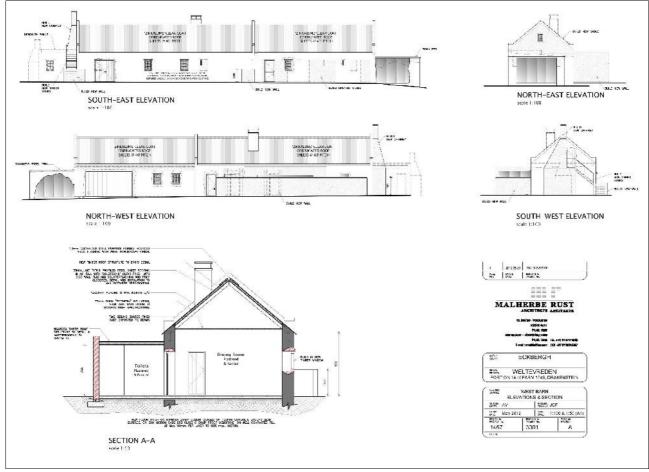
Elevations of proposed redevelopment of West Barn. © Malherbe Rust Architects
